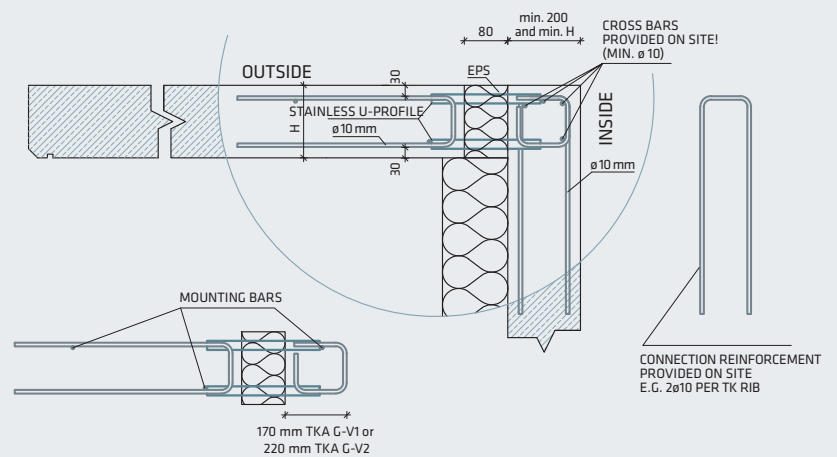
Balcony connection – wall below with TKA G-V1 or V2
